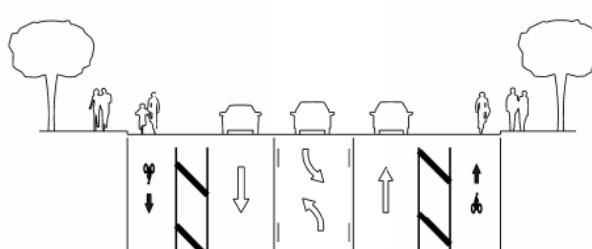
Typical Proposed Cross Section for Teri Road – IH 35 to Freidrich Ln
